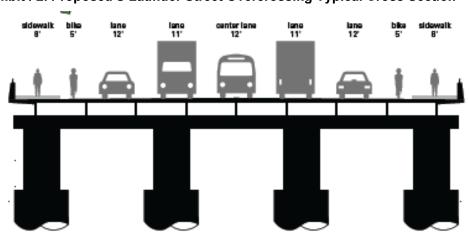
Proposed S Launder Street Overcrossing Typical Cross Section
